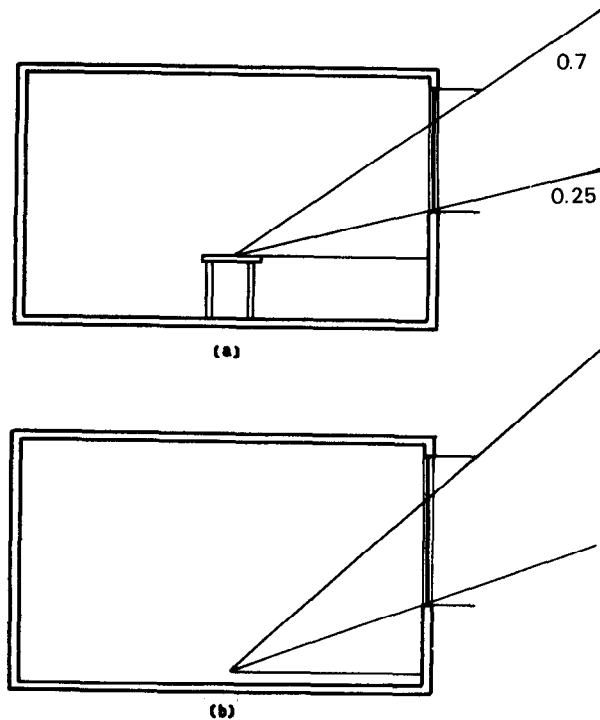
ILLUSTRATION DEPICTING USE OF PROTRACTORS ON (a) SECTIONAL ELEVATION AND (b) PLAN OF A ROOM FOR A WINDOW WITH LOUVRES (EXAMPLE 15)
